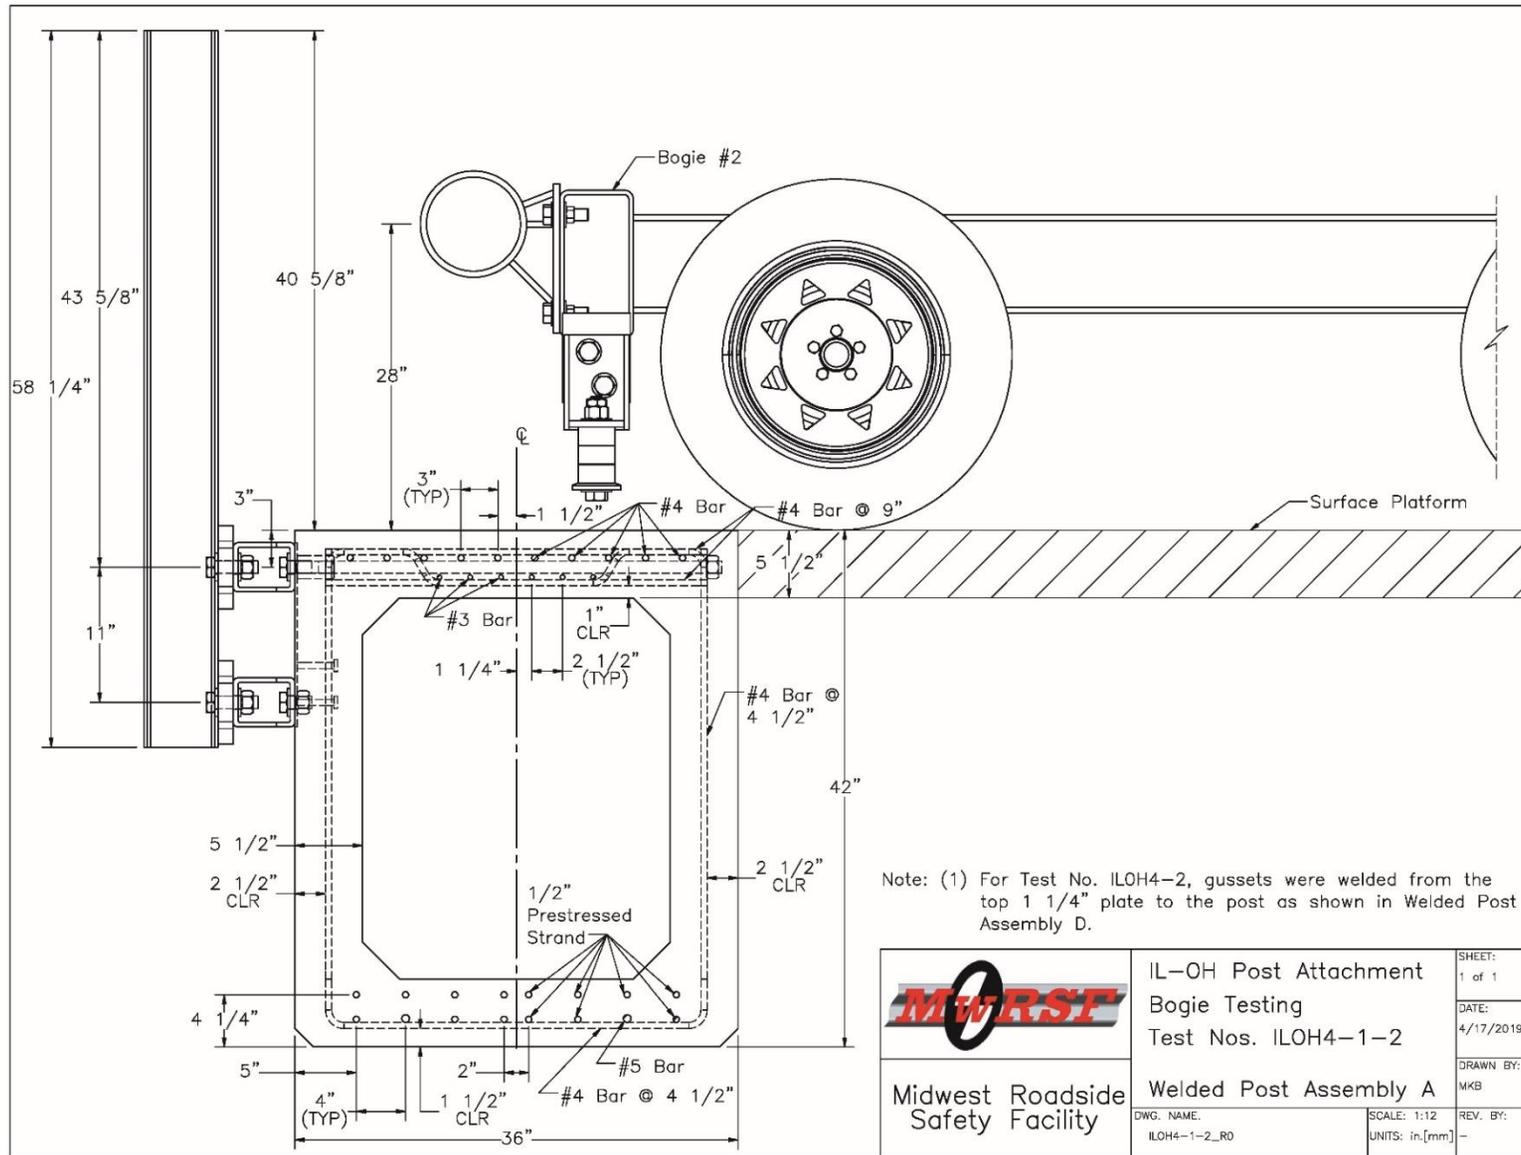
Test Configuration for Test Nos. ILOH4-1 and ILOH4-2
